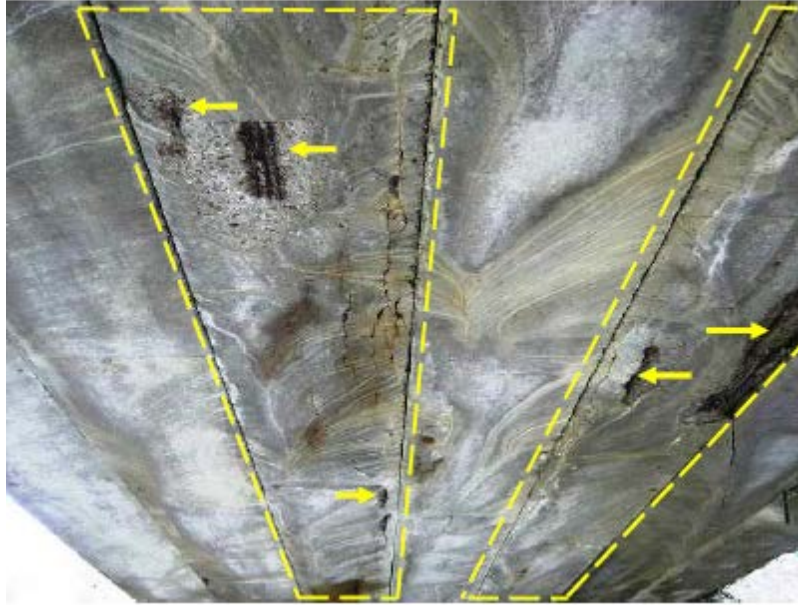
Element 104: Box Girder, Prestressed Concrete CS-4
